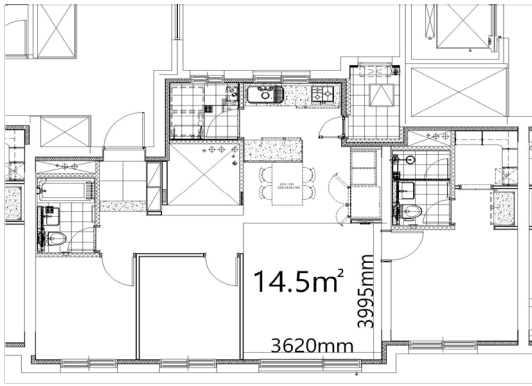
Floor plan of the unit A(59 m<sup>2</sup>, 4 bay)
